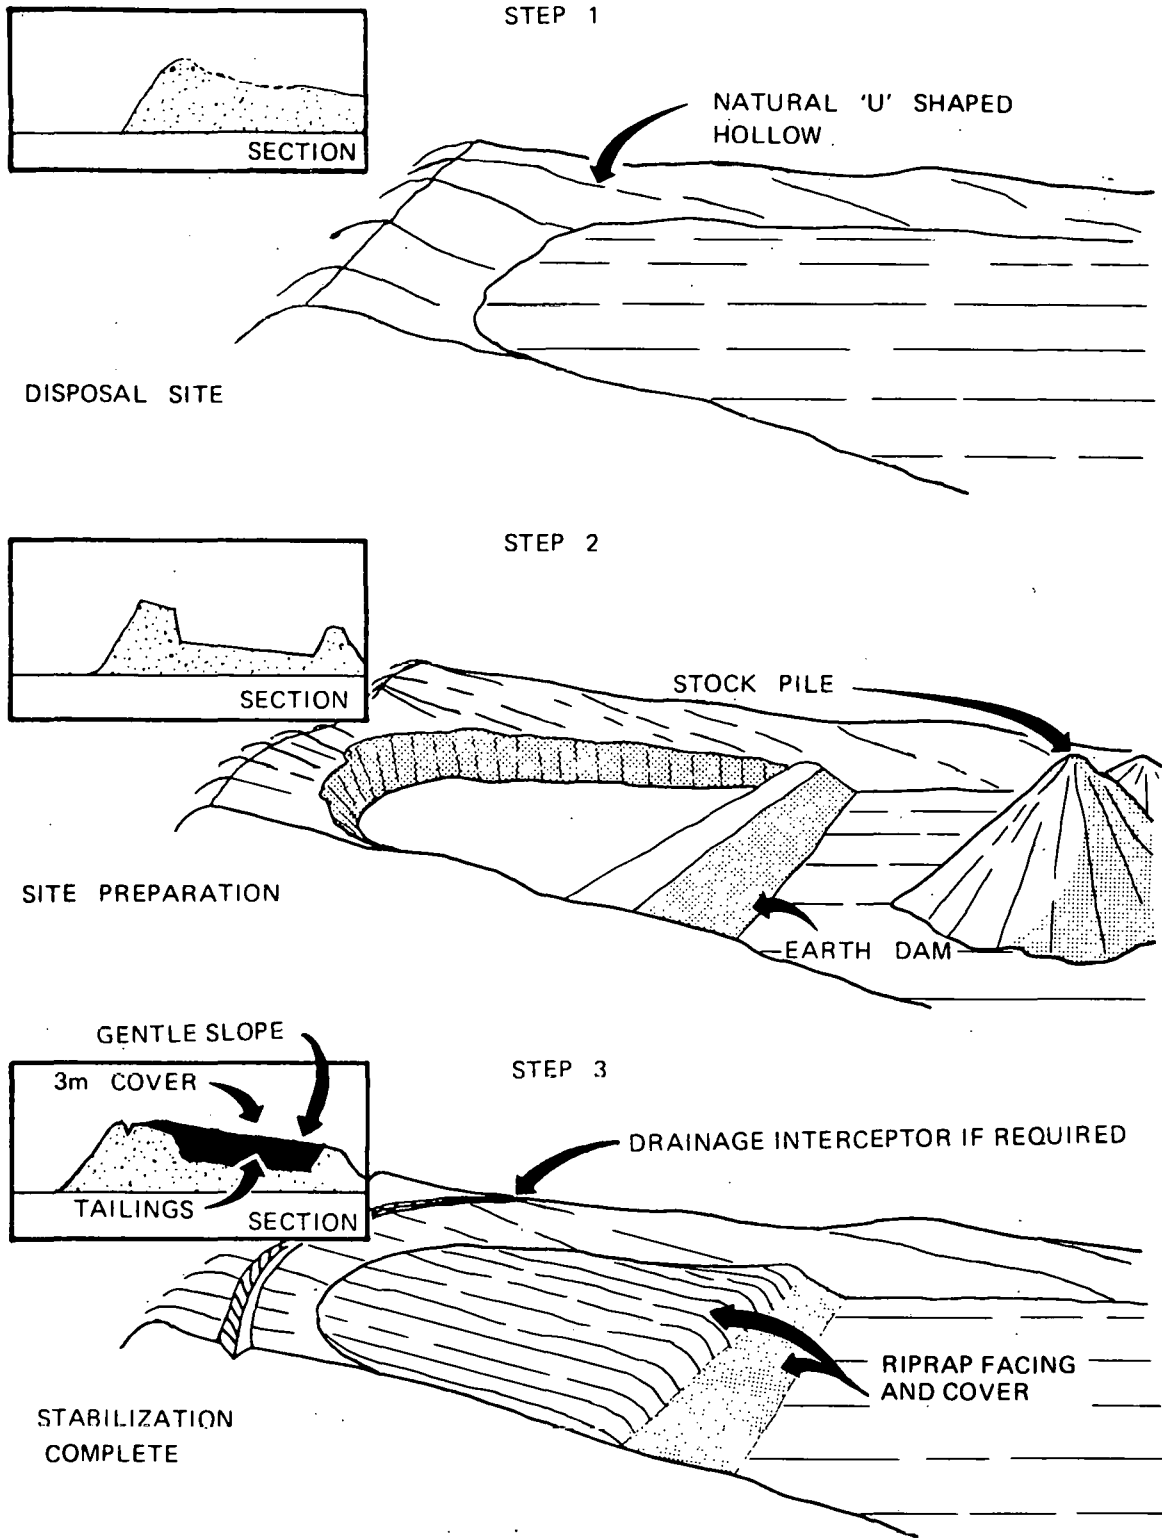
SCHEMATIC OF TYPICAL TAILINGS DISPOSAL SITE
